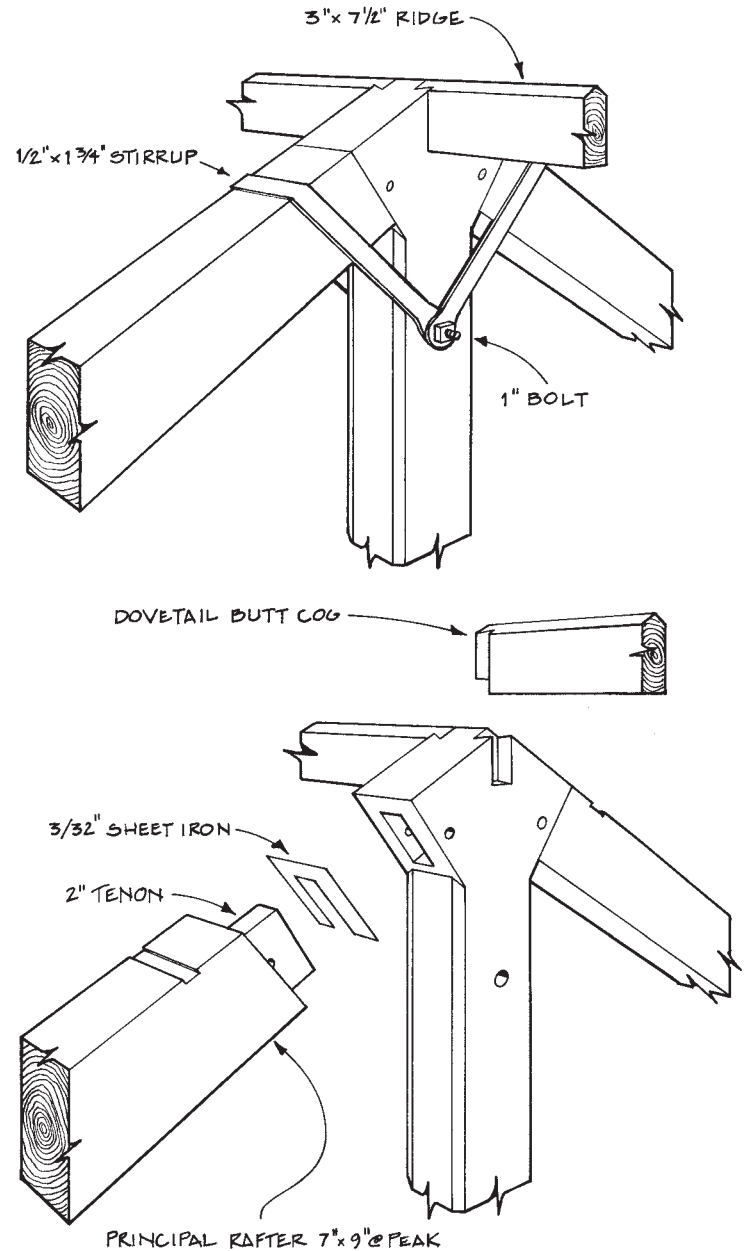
Kingpost head, exploded and assembled views, at Central Moravian Church. Sheet iron may be meant to protect joint from deforming. Post is oak; principal rafter is pine. Iron strap at top represents more belt-and-suspenders engineering.
